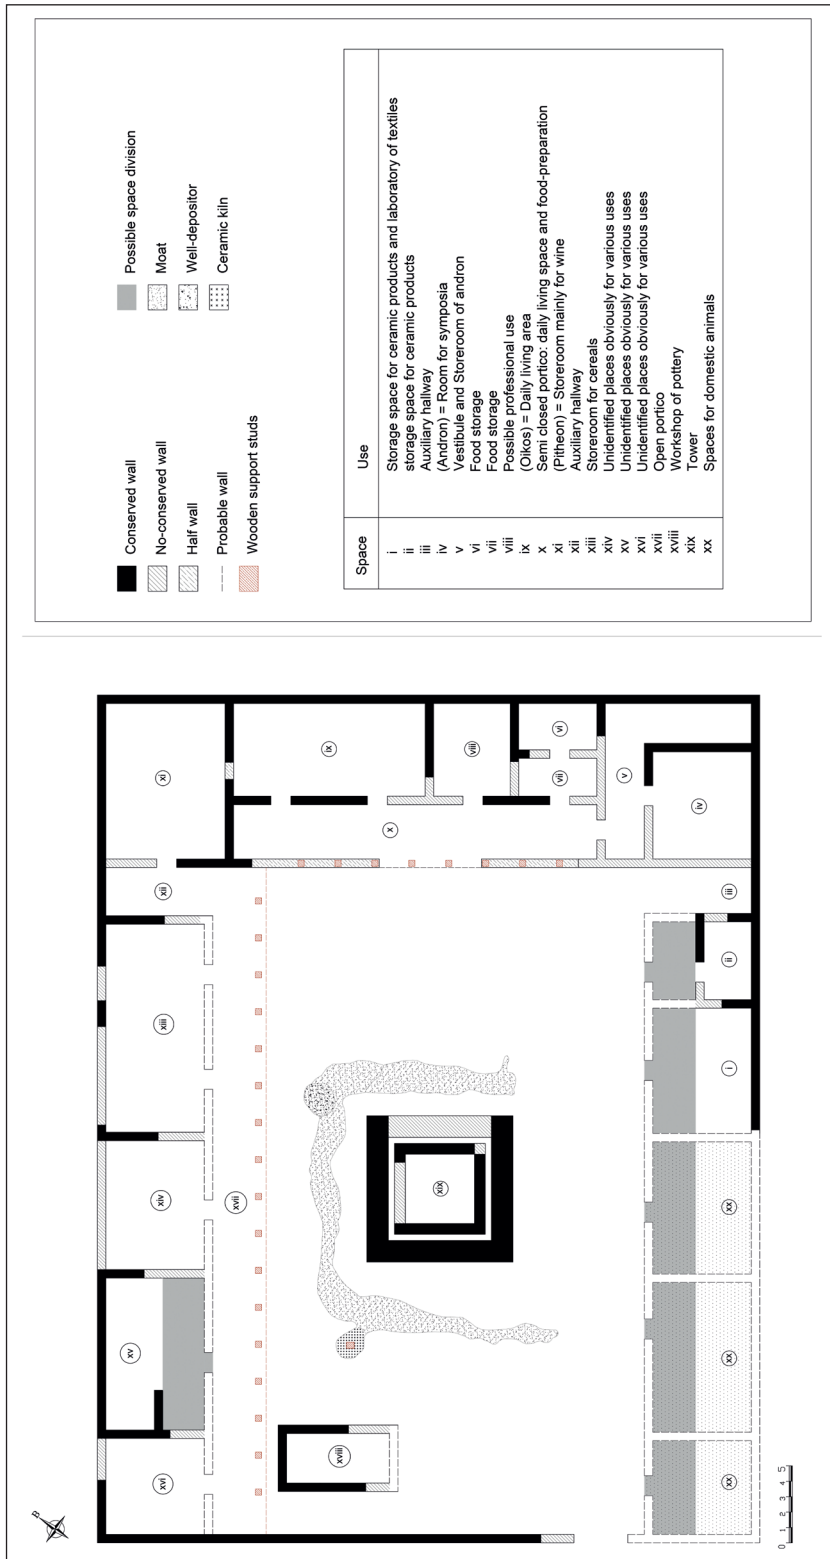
Architectural plan of farmhouse at Tria Platania.
